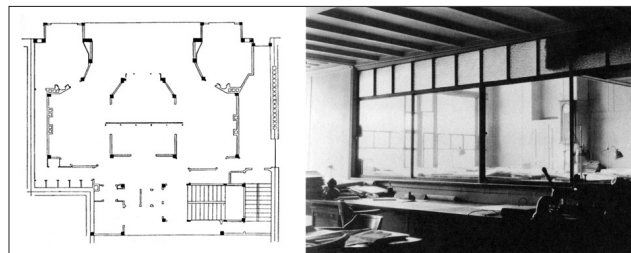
Apartment plan & office interior - 25, bis rue Franklin (A. Perret)
